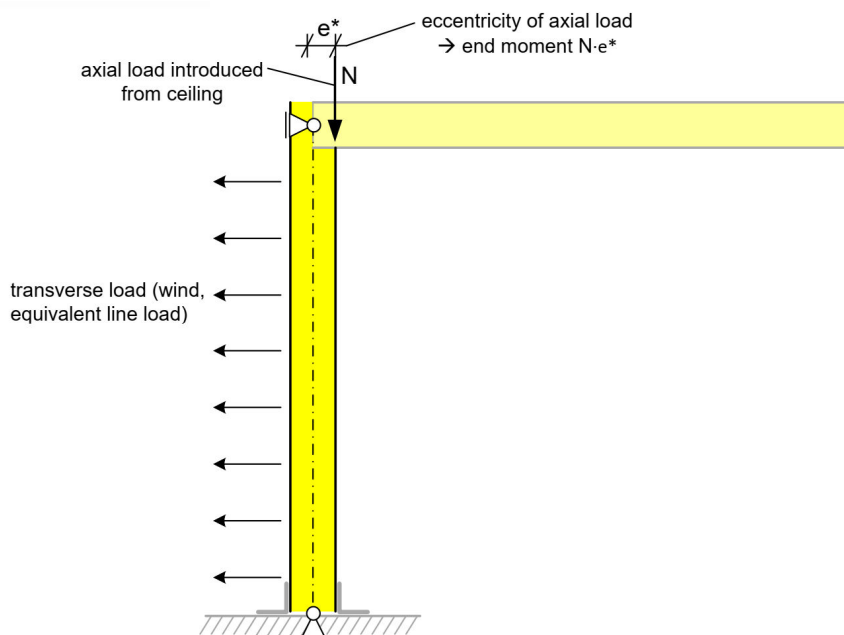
Static system of wall panels: Eccentrically Loaded Wall Panels
